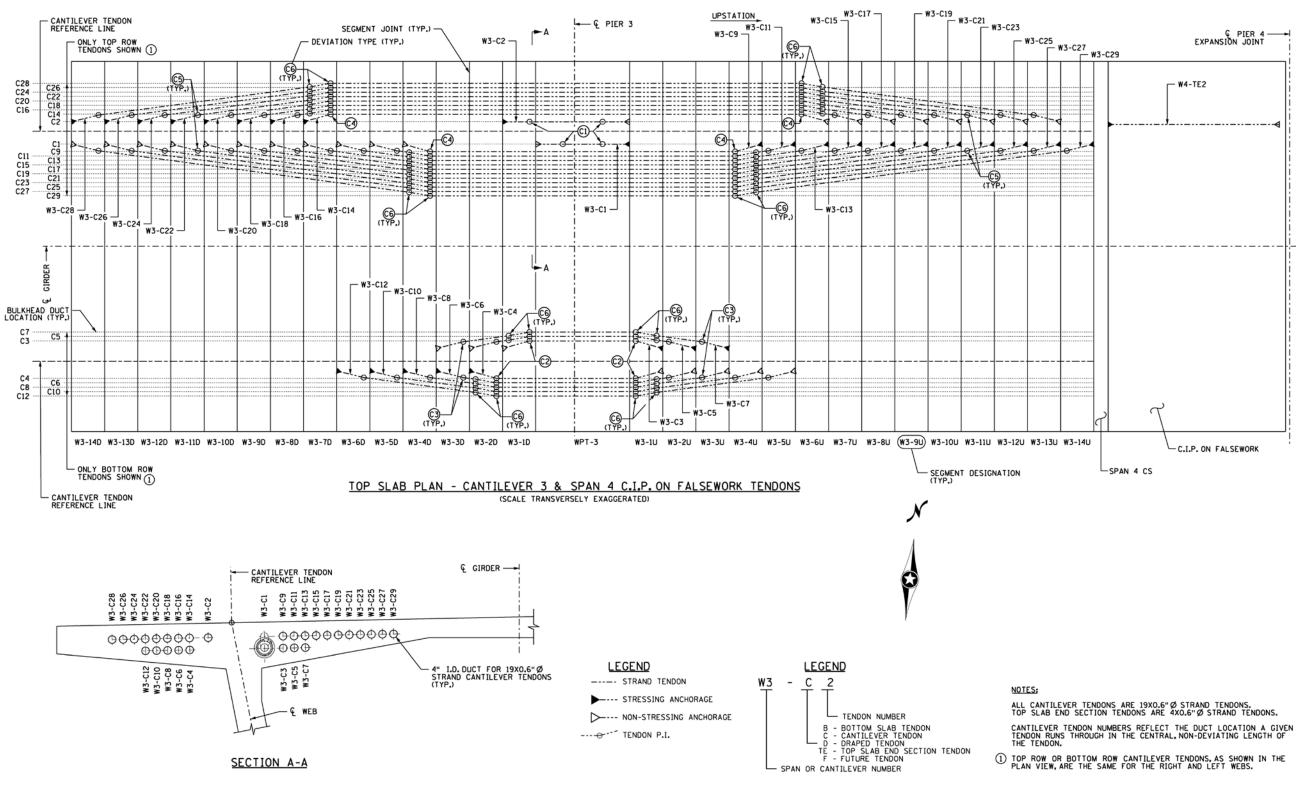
Westbound Cantilever 3 and Span 4 C.I.P. Cantilever Post-Tensioning Layout
